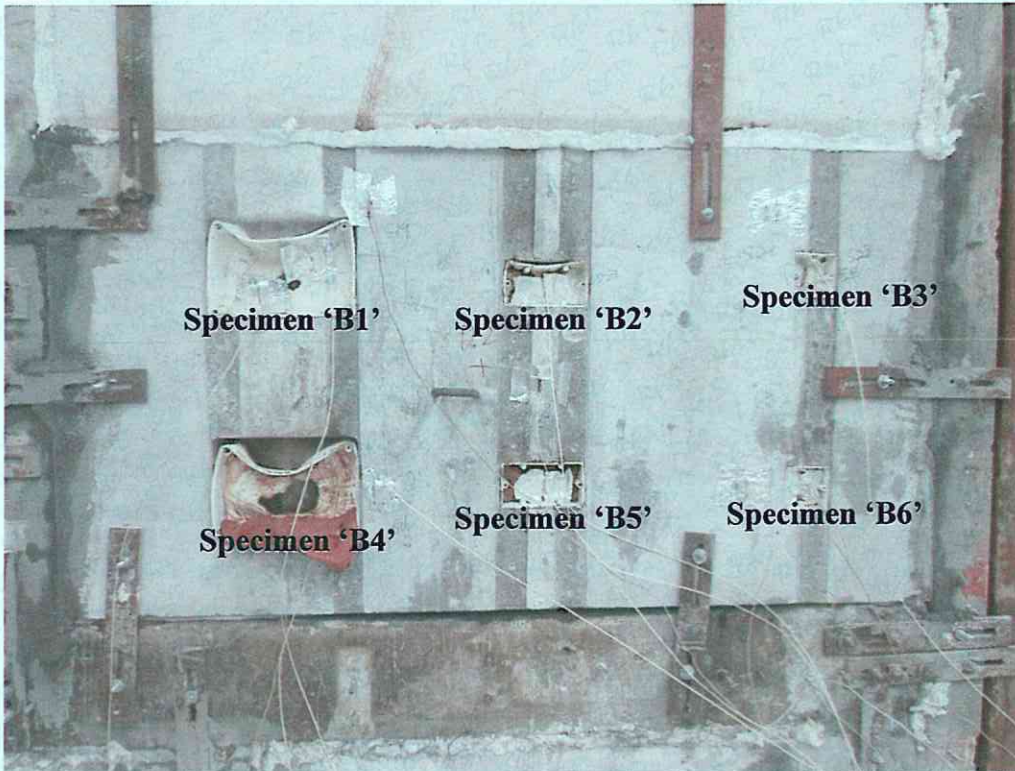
The unexposed surface of the specimen 'B' after the test.
